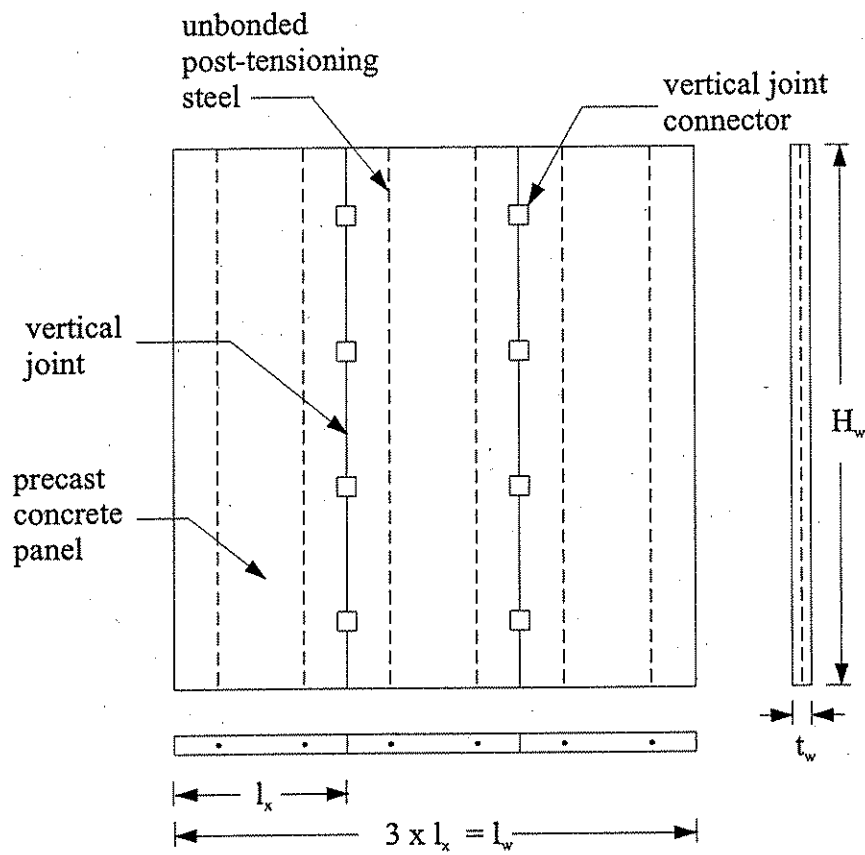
Precast wall with vertical joints between panels and vertical joint connectors.
